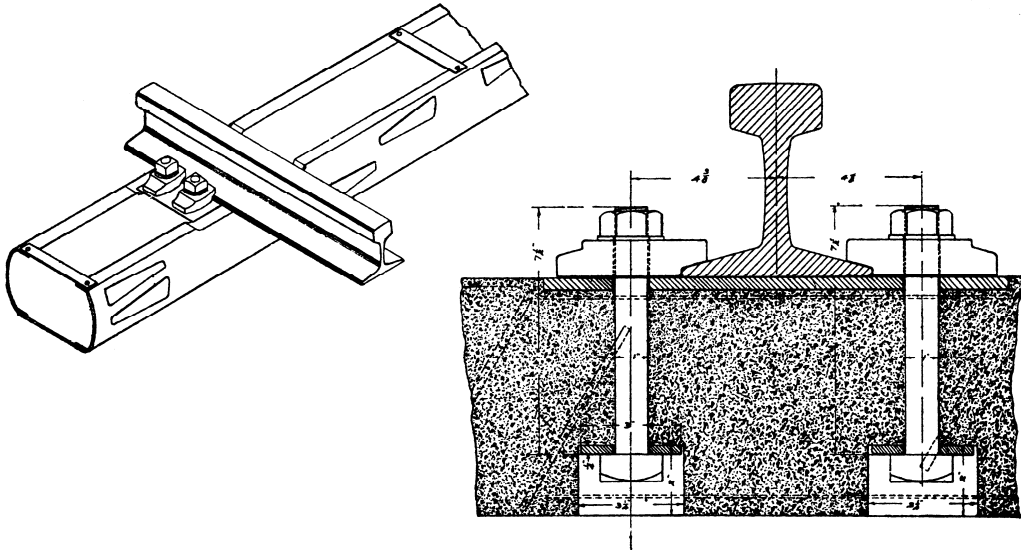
Kimball Concrete-filled Tie, installed on the Chicago and Alton Railroad (AREA 1910)
